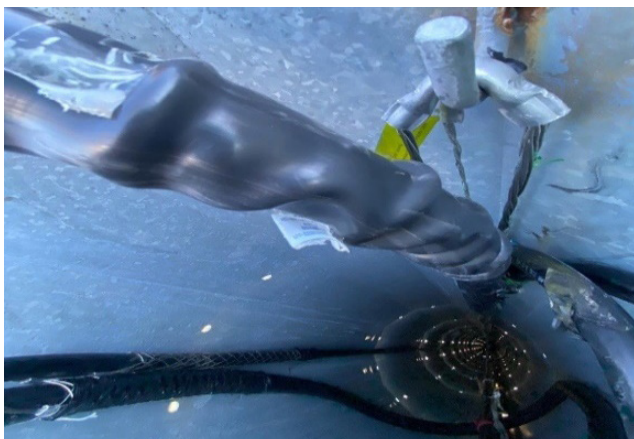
Single grip holding the weight of the cable and damaging the outer jacket.
